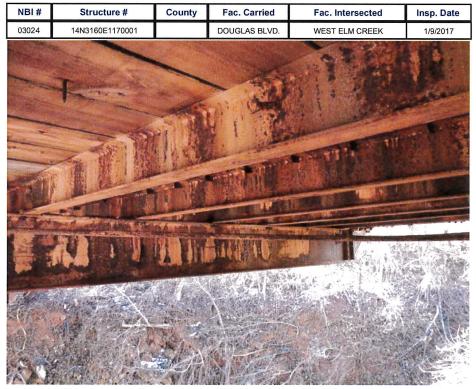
Looking south at east truss L2, bolted connection of vertical to floor beam. Note: Bolt shanks are not long enough to extend through nut. Typical to all floor beam connections.
